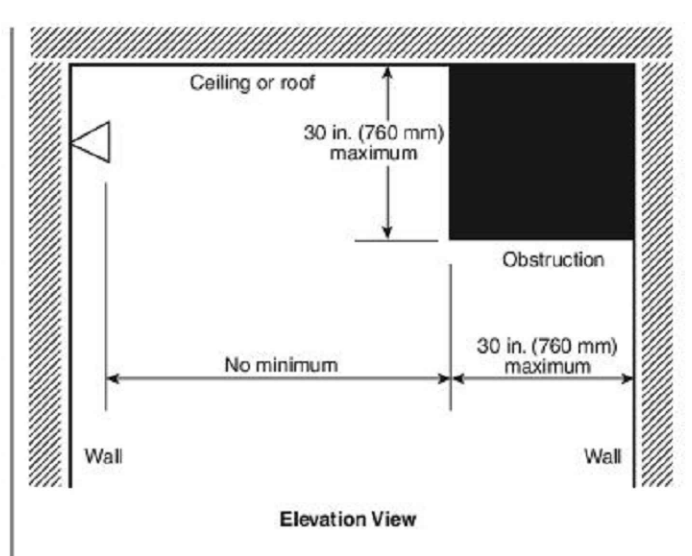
(c) Positioning of Sprinkler to Avoid Obstruction Against Wall (Residential Sidewall Sprinklers).
